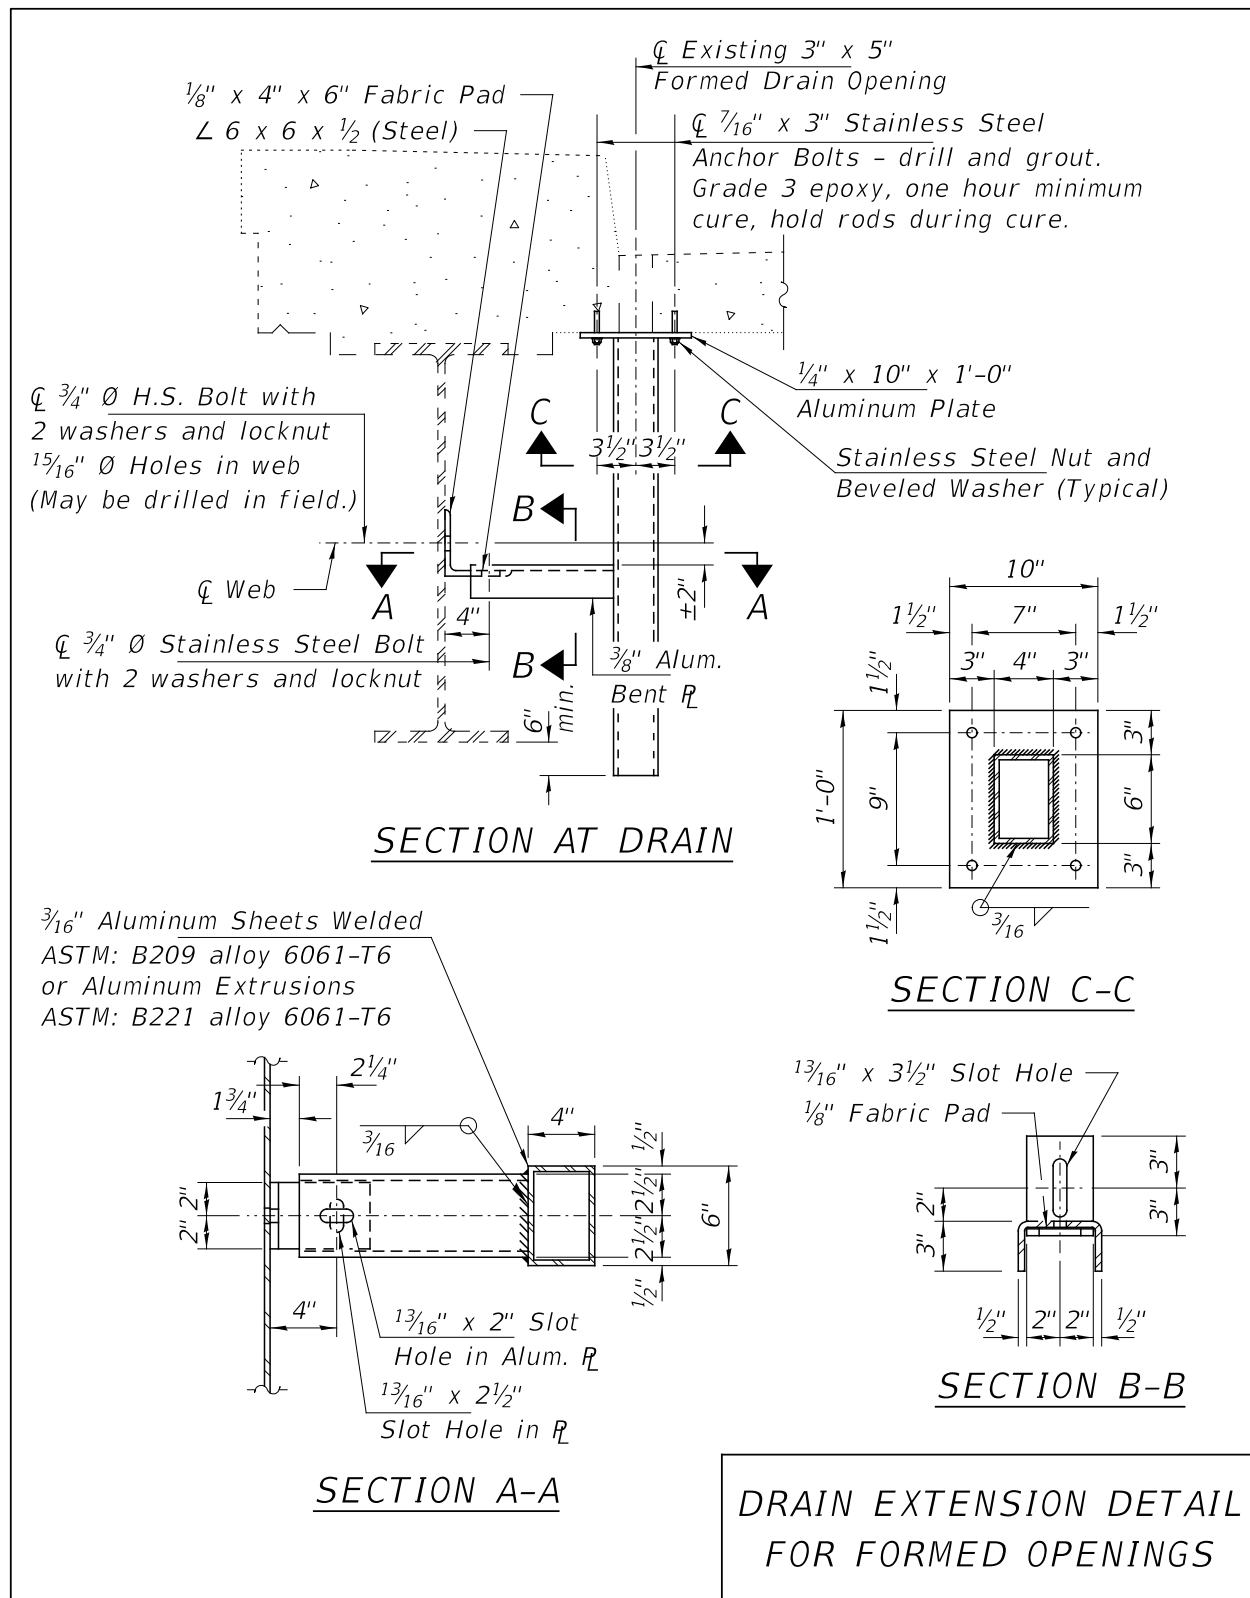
Drain Extension Detail for Formed Openings
